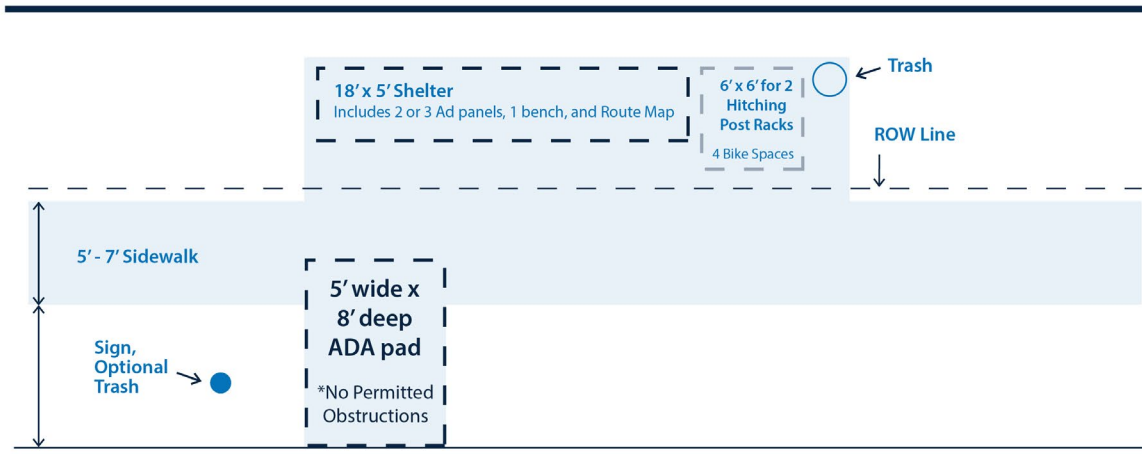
Type III Standard (Detached Sidewalk) – Amenity Detail
